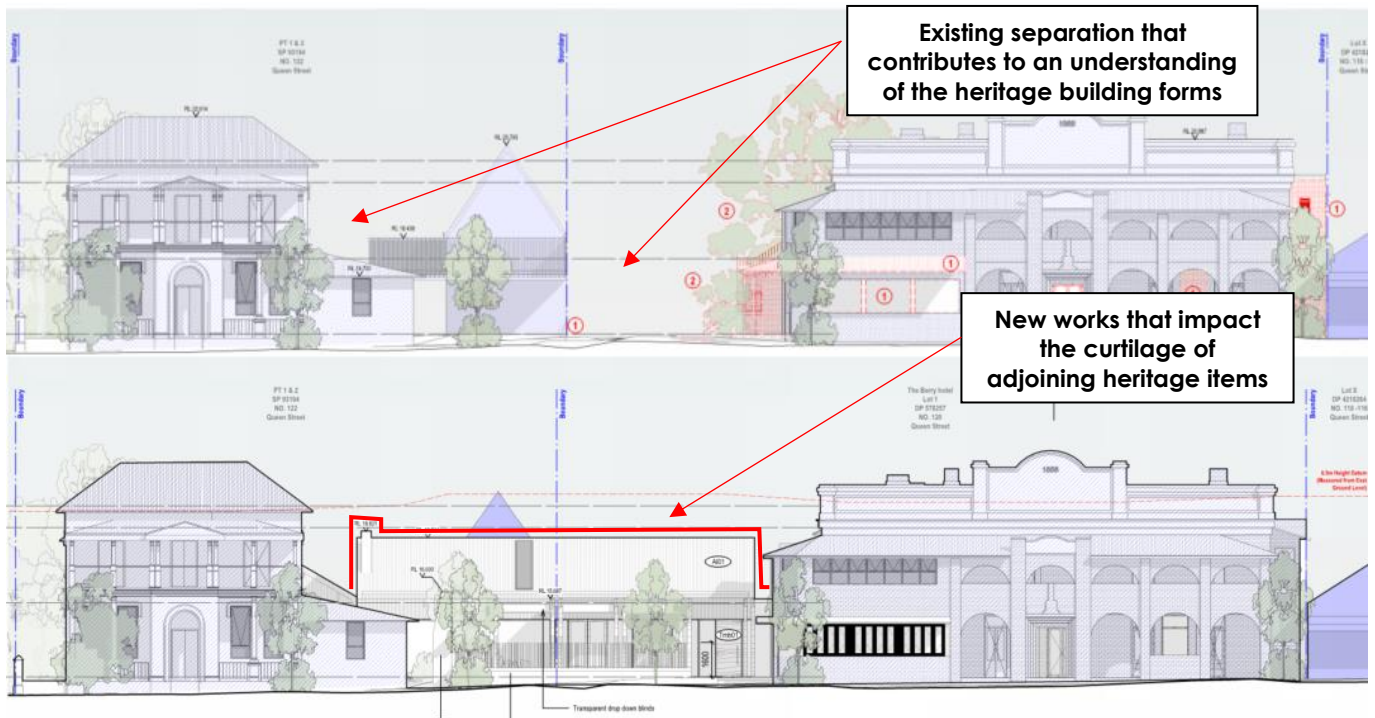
Extract from Existing (upper) and Proposed (lower) Elevations – Hotel and Bank Building (H&E Architects, 2023)
